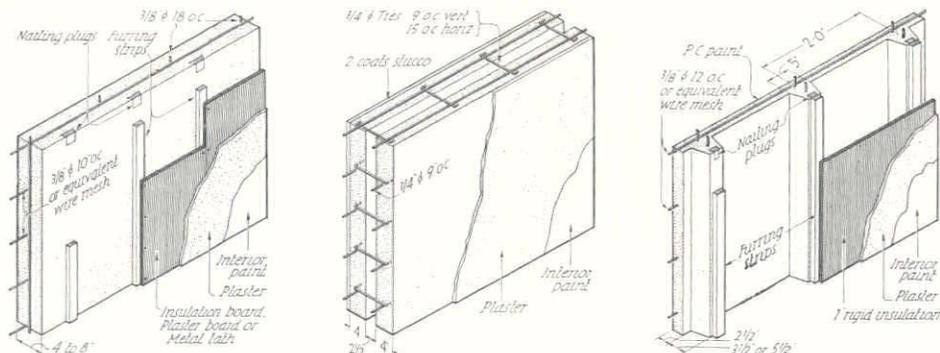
Three types of reinforced concrete walls. Additional reinforcement required at sill, lintel, and jamb lines is not shown
